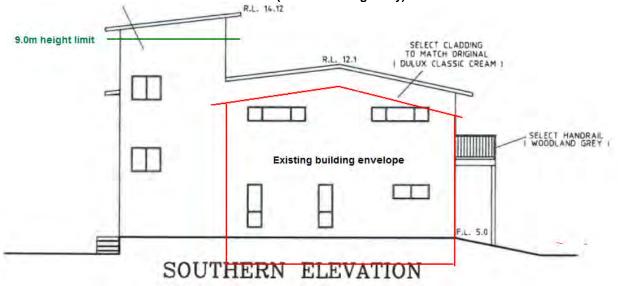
Southern Elevation depicting existing envelope, proposed additions and 9.0m height limit
